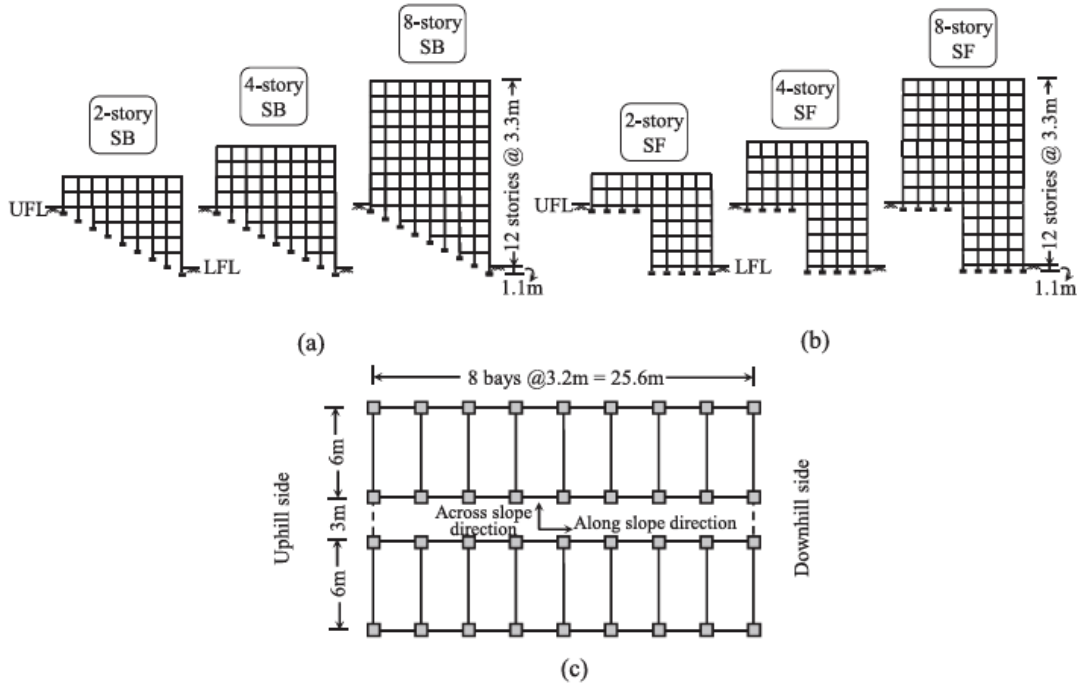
(a) Elevation of 2-, 4-, 8-story SB building models, (b) elevation of 2-, 4-, 8-story SF building models, and (c) generic plan of the buildings [18]
